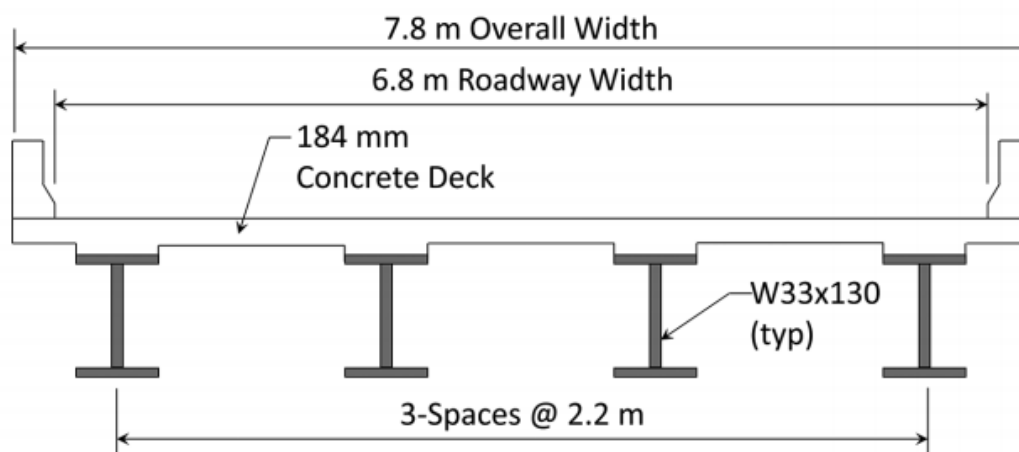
AASHTO MBE Example Bridge A1 Cross-section (Tohme and Yarnold, 2020)
